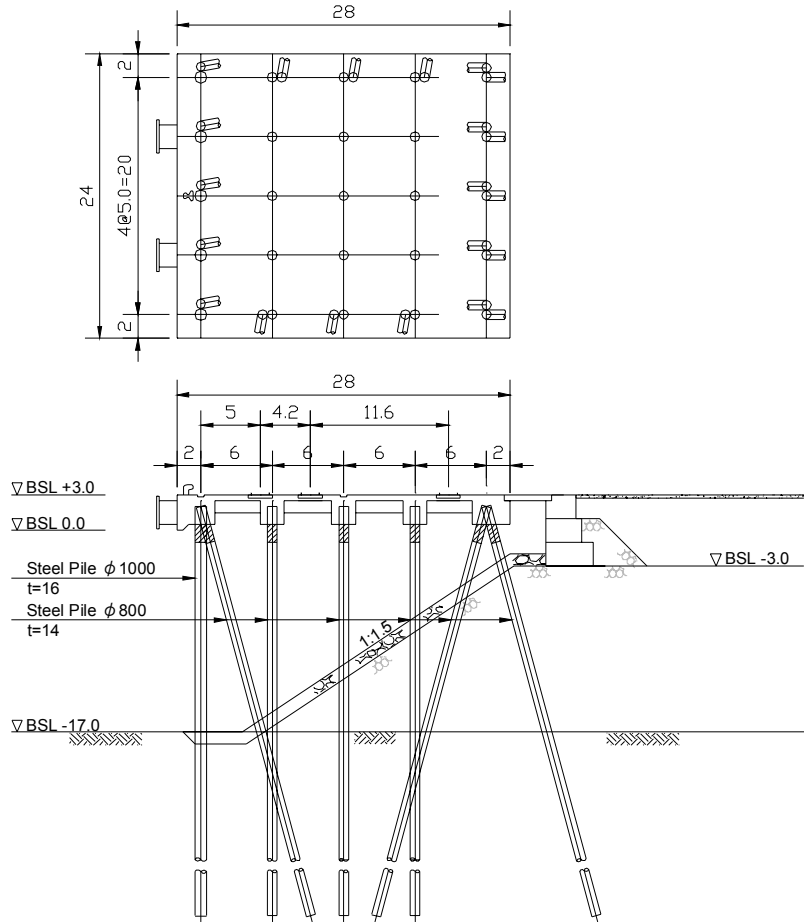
Cross-Section of Relieving Platform-Type Structure (Berth No. 2)
